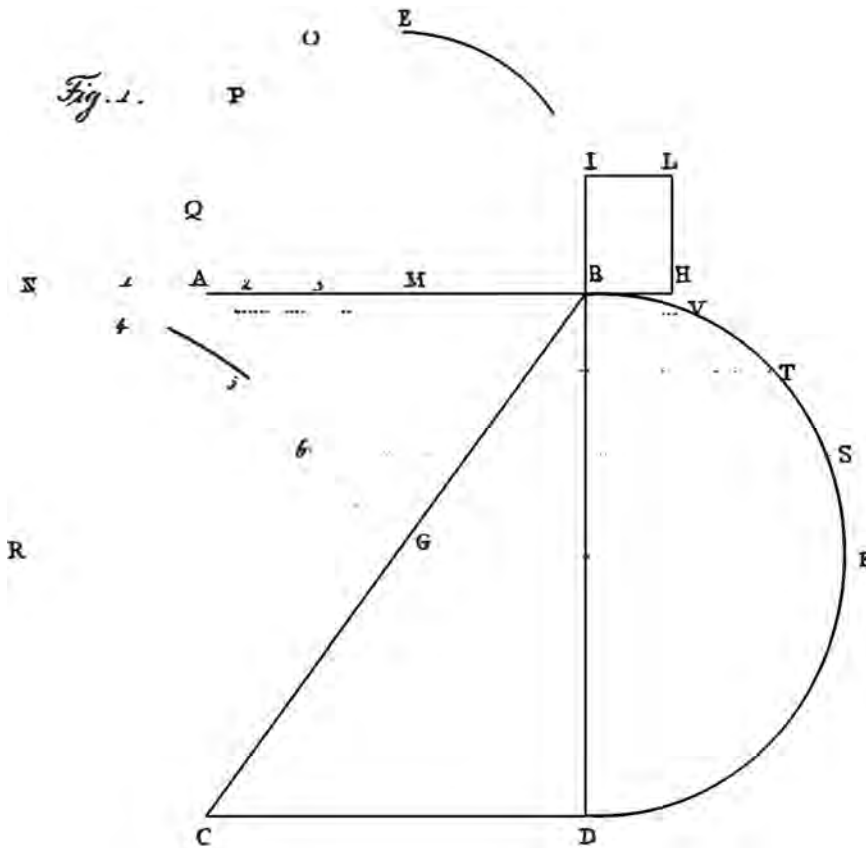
Valadier's geometrical construction (Chart 256) for calculating the abutment's dimensions for a cross vault
